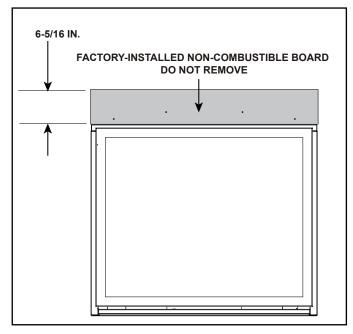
Non-Combustible Board - Generic Decorative Barrier Front Shown
